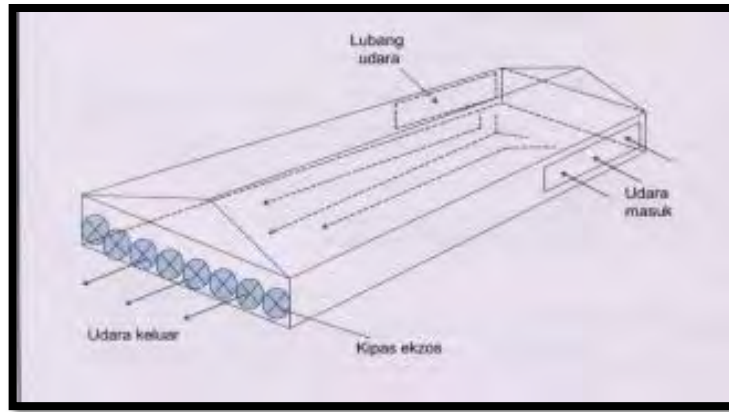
Tunnel ventilation (Unimap portal30).
